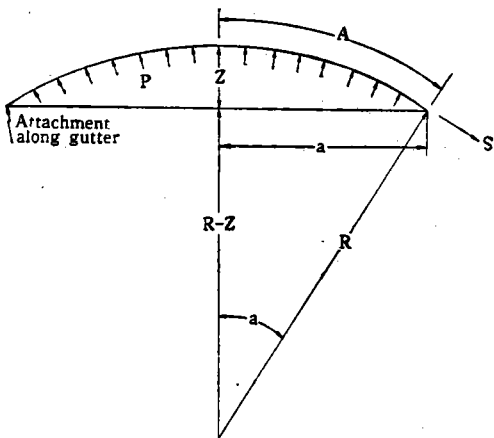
Geometry and Stresses in a Roof Section of the Cable Support House
